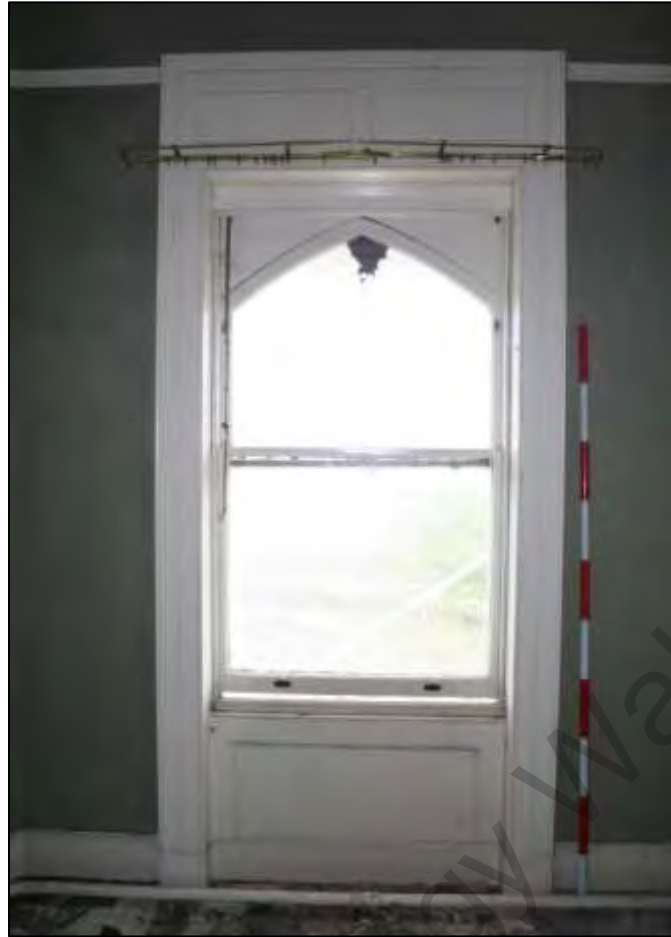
Central window on east wall of Room 13, view east. Scale 2m.
